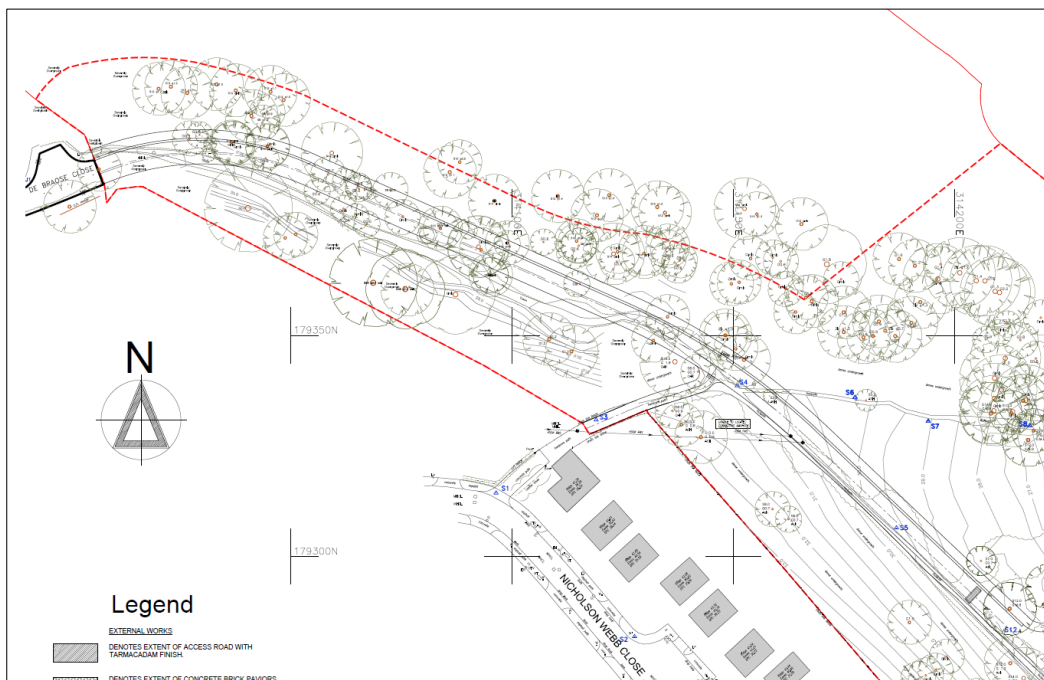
Extract from Site Layout Plan showing Proposed Access Road from De Braose Close
